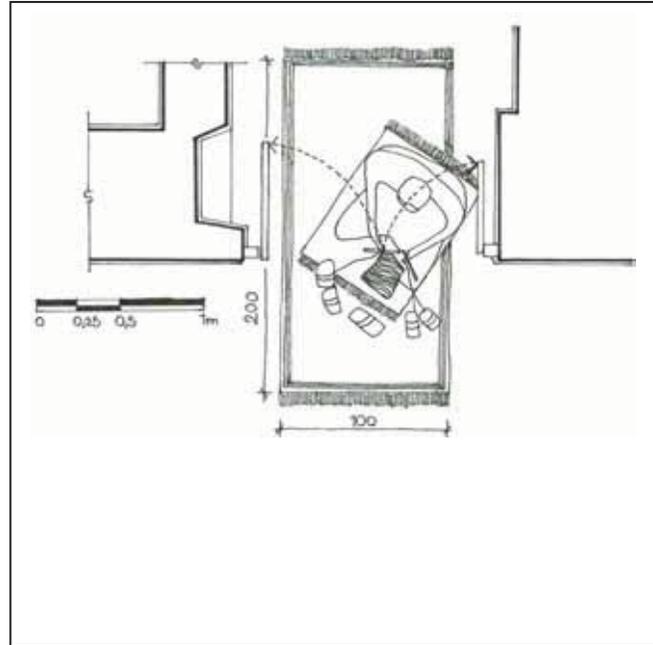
Plan of the house workshop. Drawing by author, 2008.
